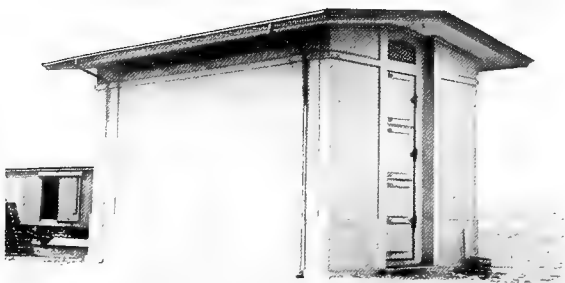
Ice House with Concrete Roof, Armour Farm, Lake Forest, Ill. A practical structure of pleasing appearance and permanent construction.
